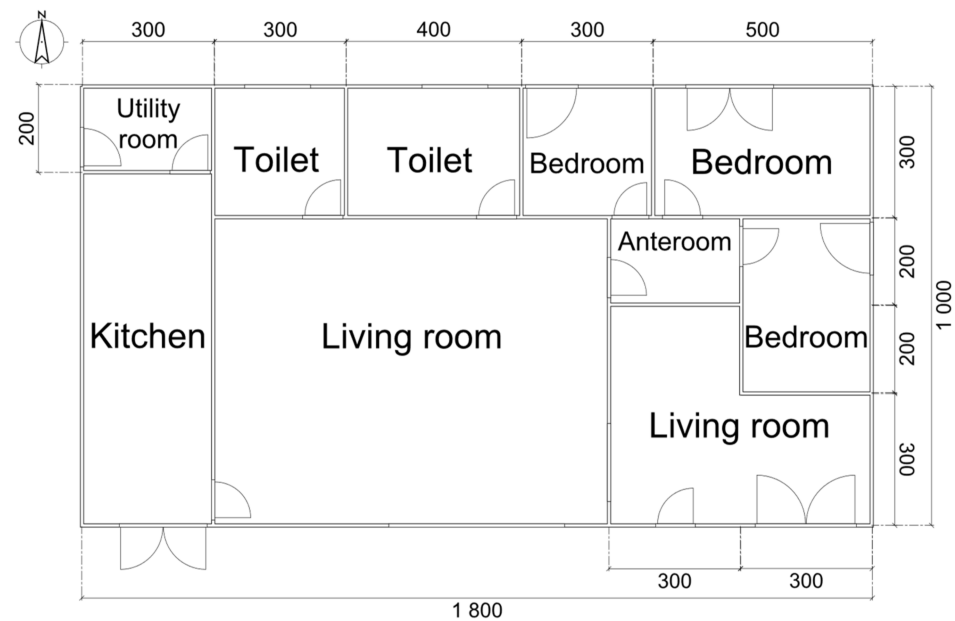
Plan views of the benchmark single detached house (dimensions in cm).
